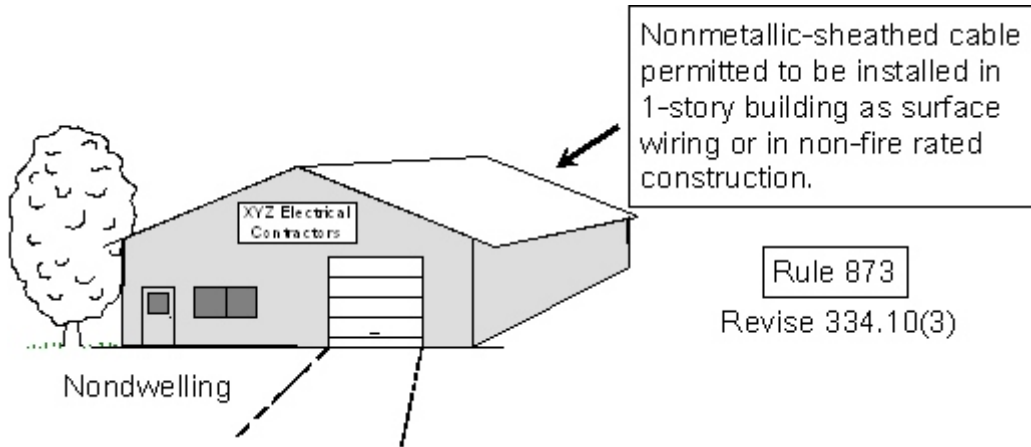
Nonmetallic-Sheathed Cable is permitted to be installed as surface wiring or concealed except for buildings of two or more floors and then it must be installed concealed within walls, floors, or ceilings with a 15-minute fire rating.
